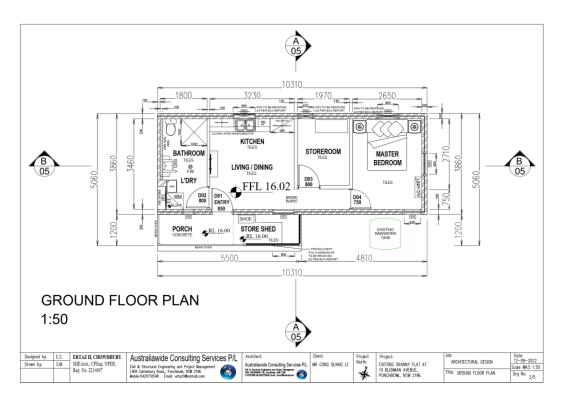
Ground Floor Plan of AS BUILT Existing 1 bedroom Granny Flat at 10 Blenman Avenue Punchbowl, NSW 2196
